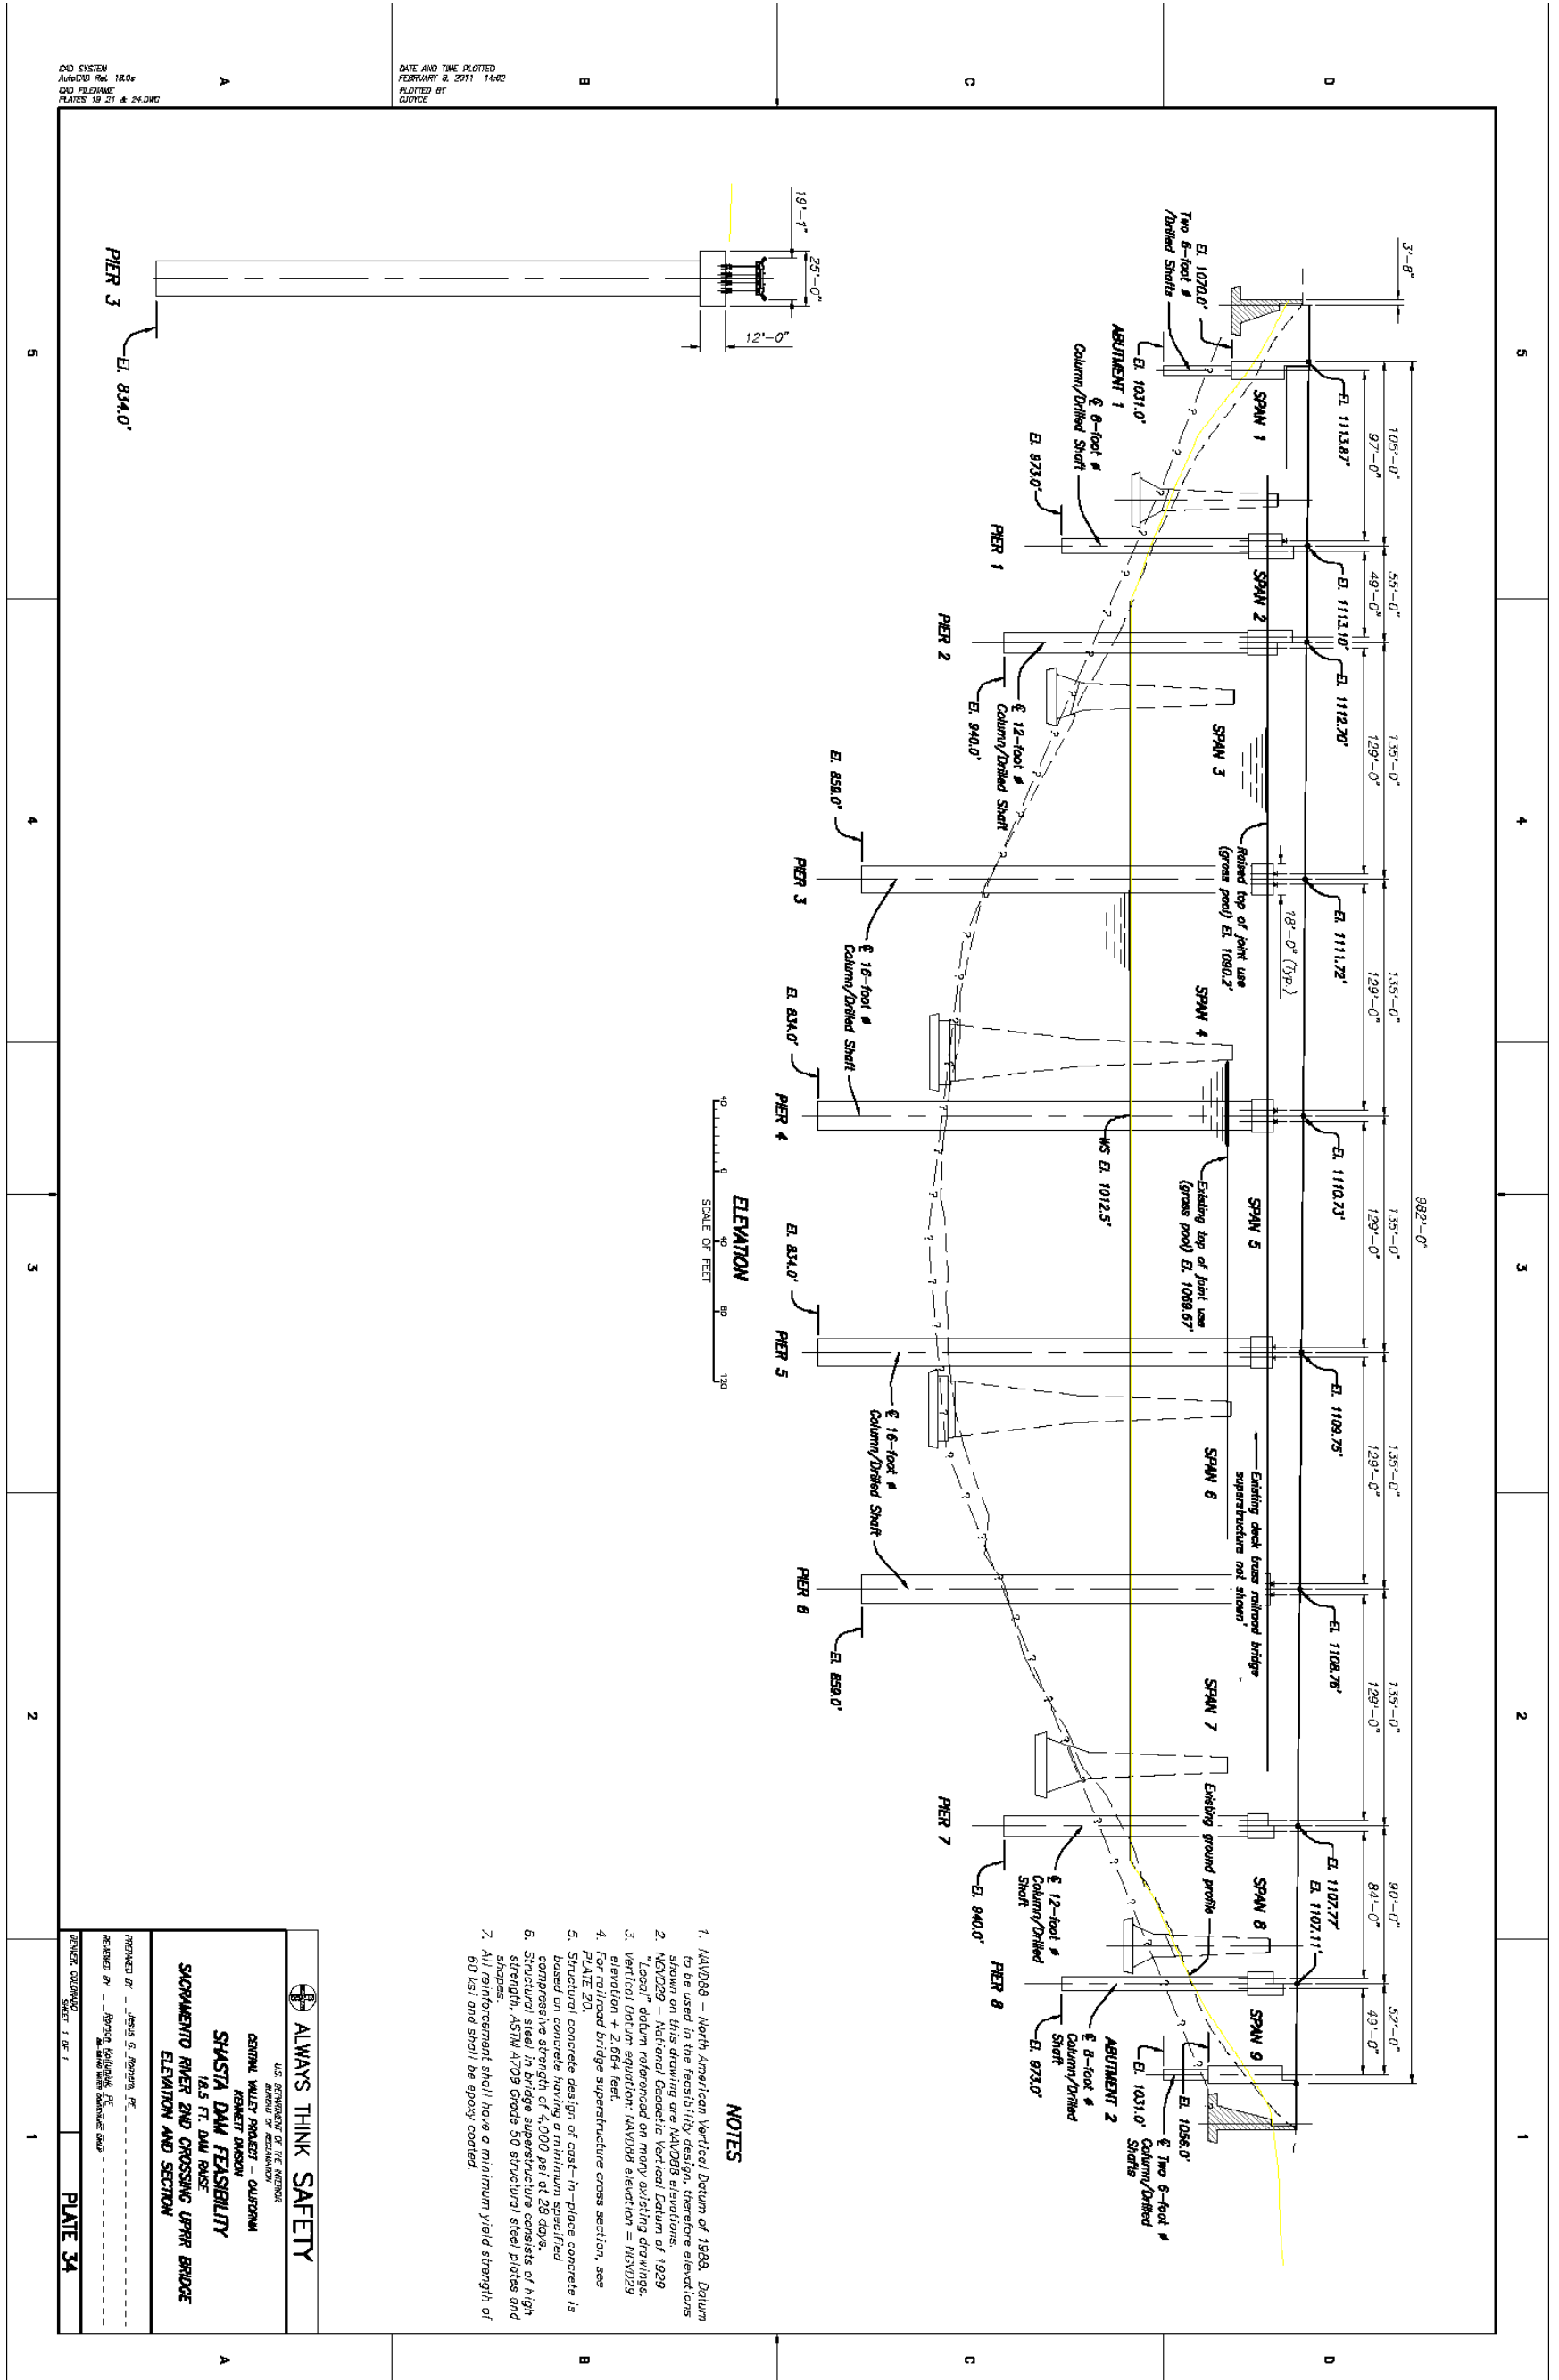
Sacramento River 2<sup>nd</sup> Crossing UPRR Bridge – Elevation and Section
